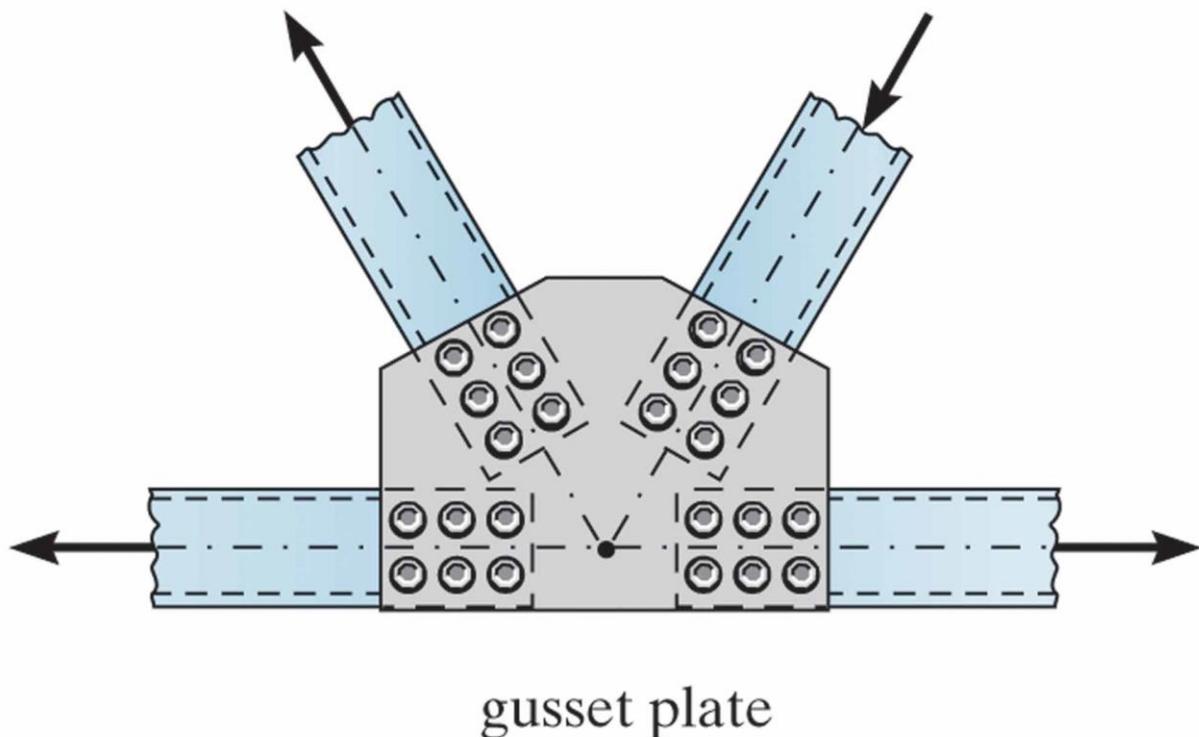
Typical Truss Bridge joint^[16]. Ponnuswamy(2014)
